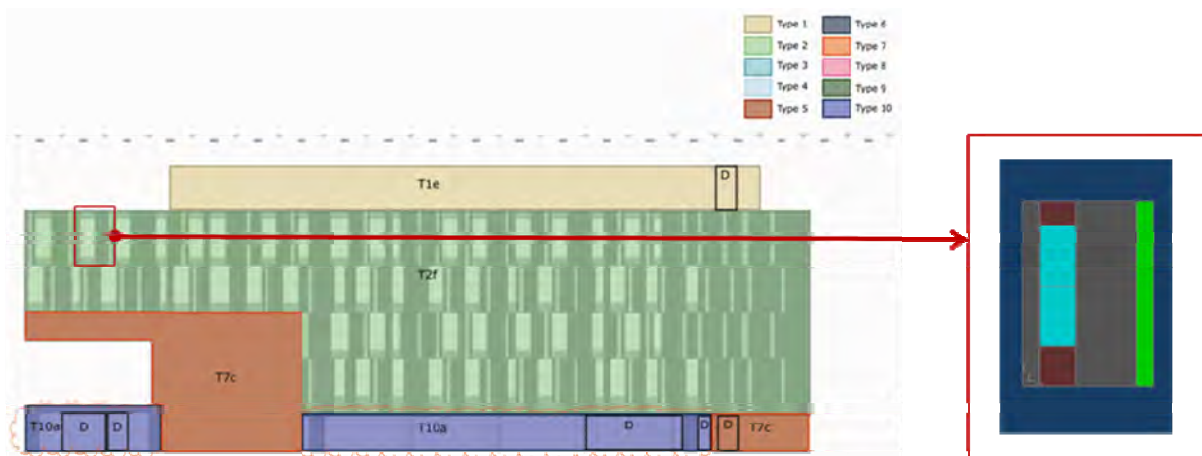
An elevation of Oxford Brookes. The section of the façade used in the test is highlighted with a red rectangle. (Image on left generated by Ramboll Façade Team)
